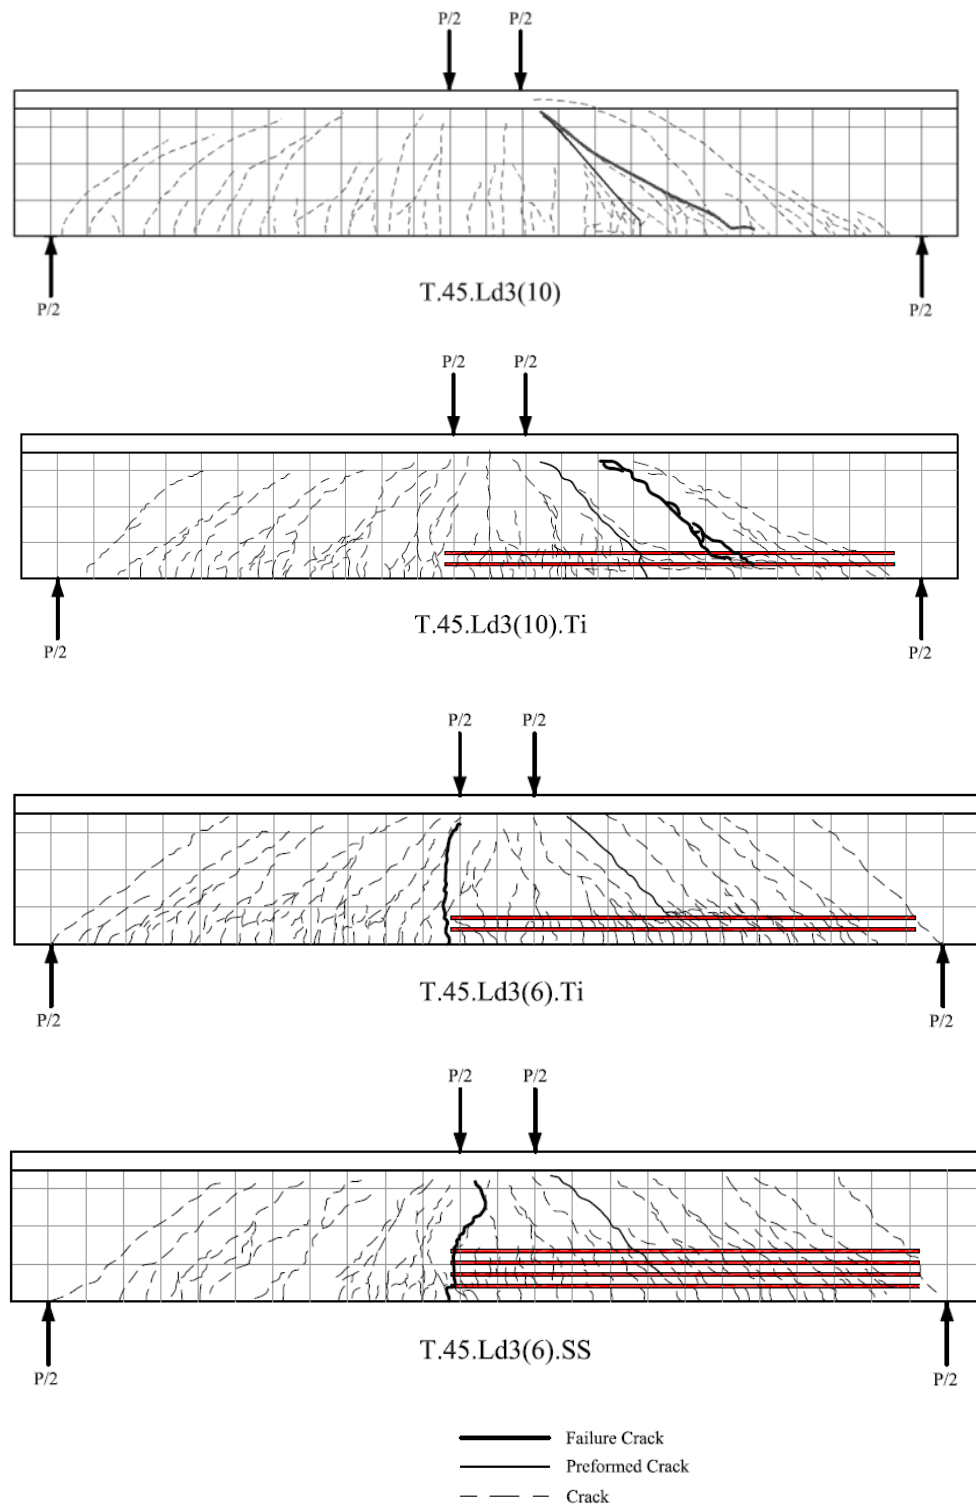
Crack patterns for T-specimens at failure (specimen T.45.Ld3(10) from Triska (2010))
